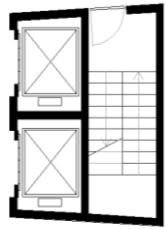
Normal core plan on the bottom and exceptional core plan on top
